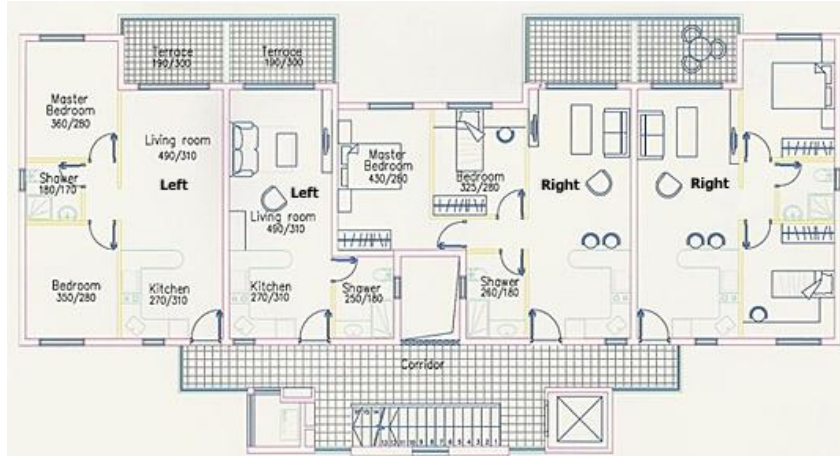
Augustus block, one bedroom apartment plan 64 Sqm and a two bedroom apartment plan 75.5 Sqm
